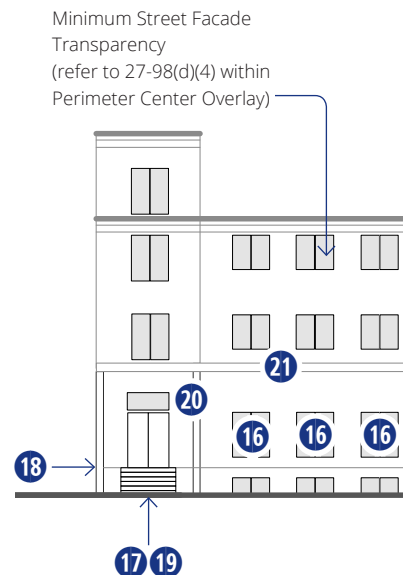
Civic Building: Street Facade Design Requirements
